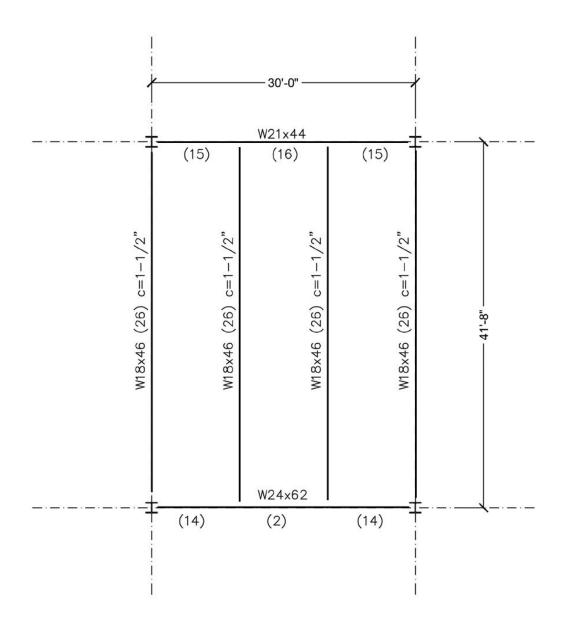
TYPICAL COMPOSITE LAYOUT
